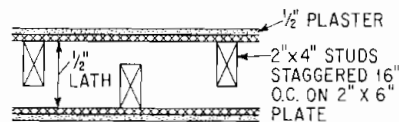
A cross section of a sound-insulating partition. Wooden walls should be constructed in this manner to reduce external noise.
